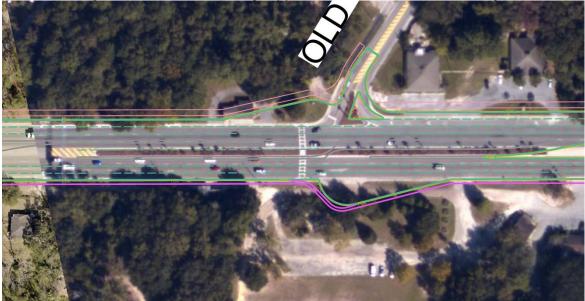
Old Wild Horse Road Signal (B) – Spanish Wells Road Intersection Concept
